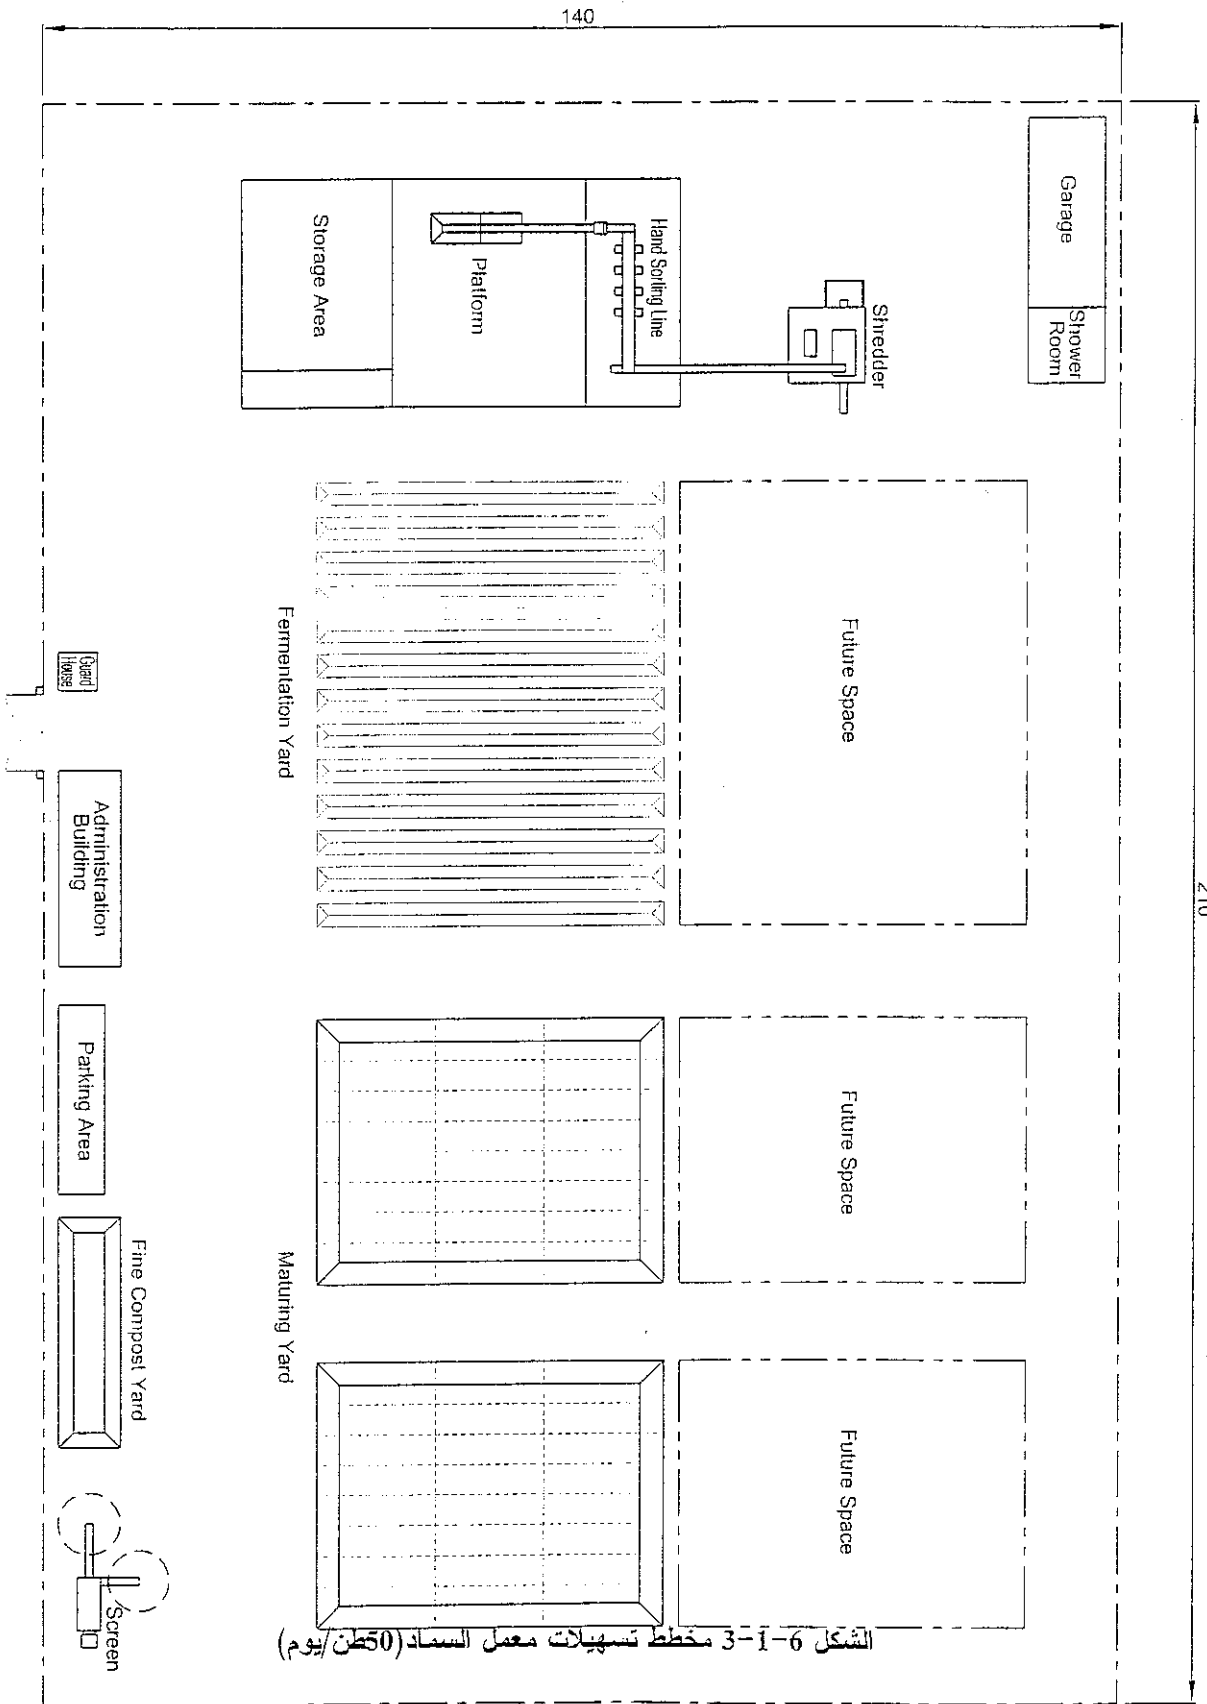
Facility Plan of Compost Plant (50 ton/day)
